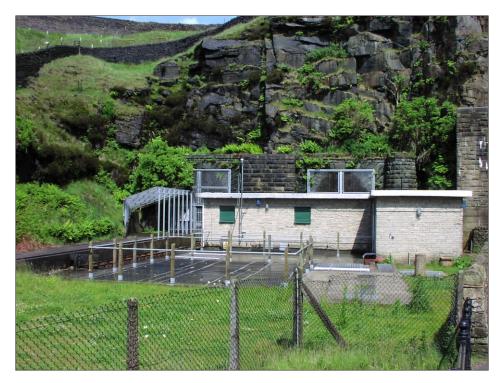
Woodhead Tunnel: View of western portal at Woodhead
